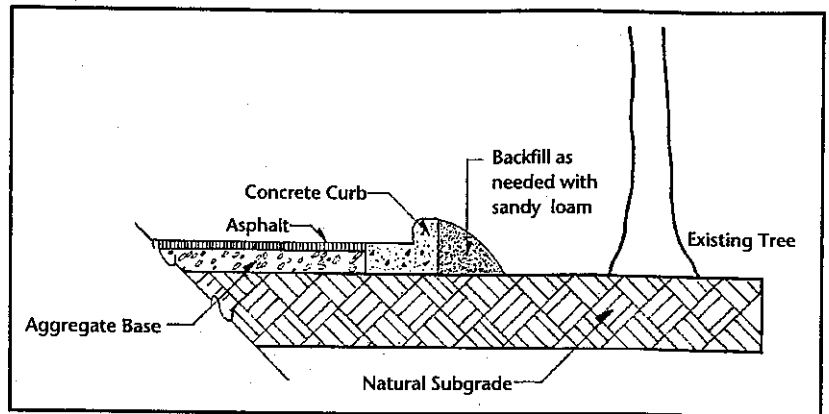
A "no-dig" type of pavement places the pavement section atop natural grade, thereby minimizing root disturbance and soil compaction. Extra reinforcement in the pavement and use of a geotextile under the base material may be needed to increase the stability of the pavement. (Adapted from a detail provided by Mary Ann Beale, City of Charlotte, North Carolina.)
